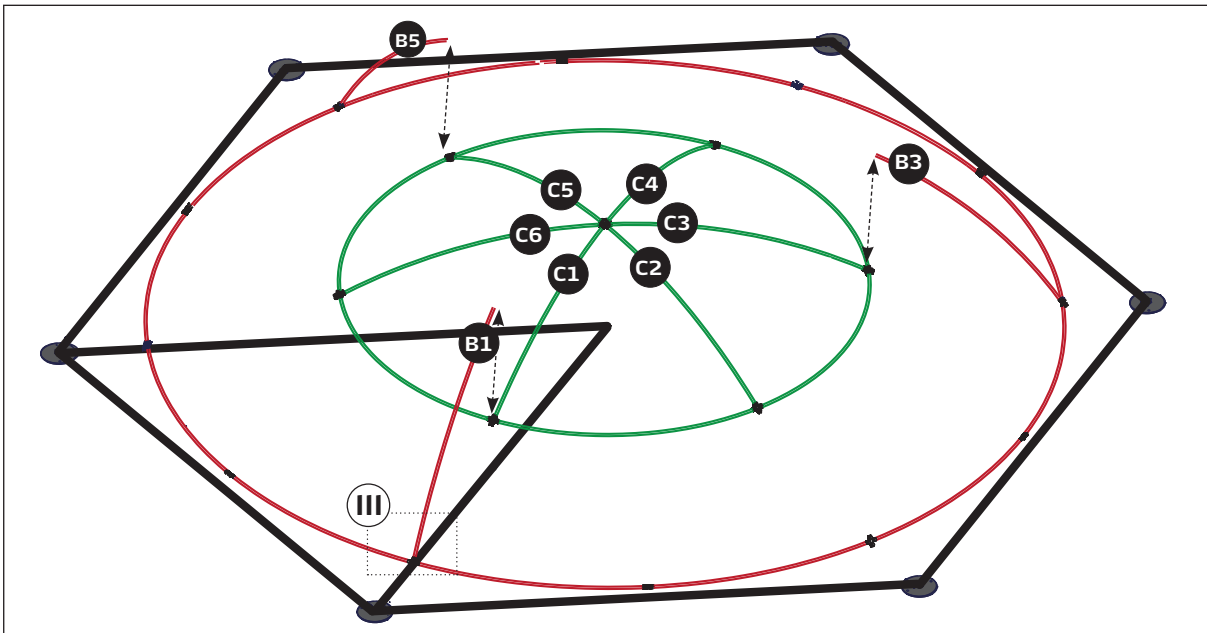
Assembling the circle: Poles and 4-pole connecting pieces.
